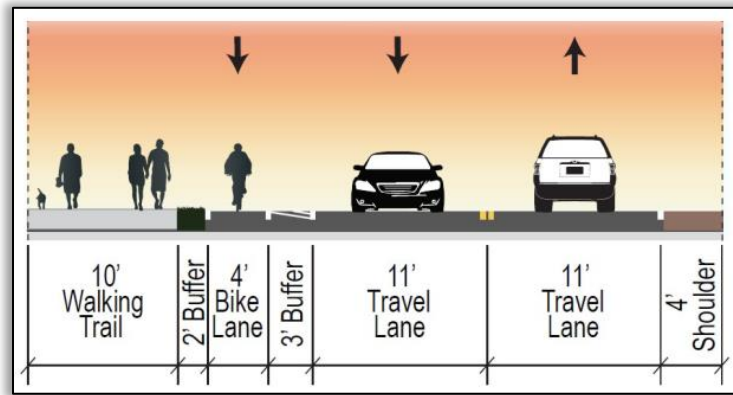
Concept for a Complete Street Typical Section on Bishops Lodge in Santa Fe
